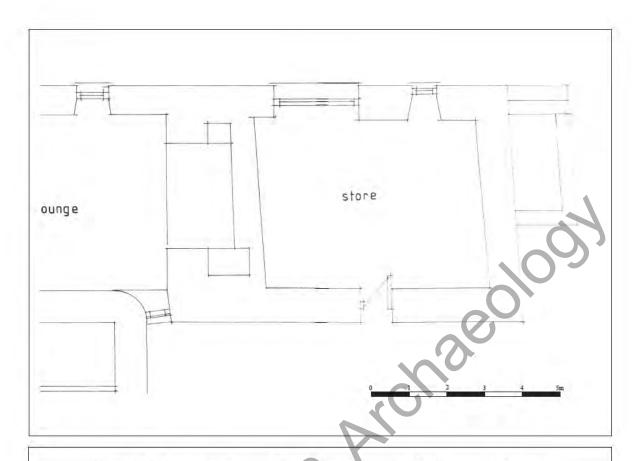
Existing Ground Floor Plan (Provided by Property Owner)
